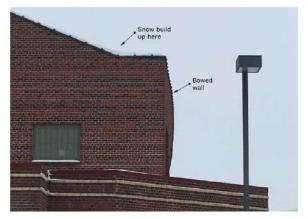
Paradigm photograph showing outward bow at parapet wall (Paradigm 2018)
